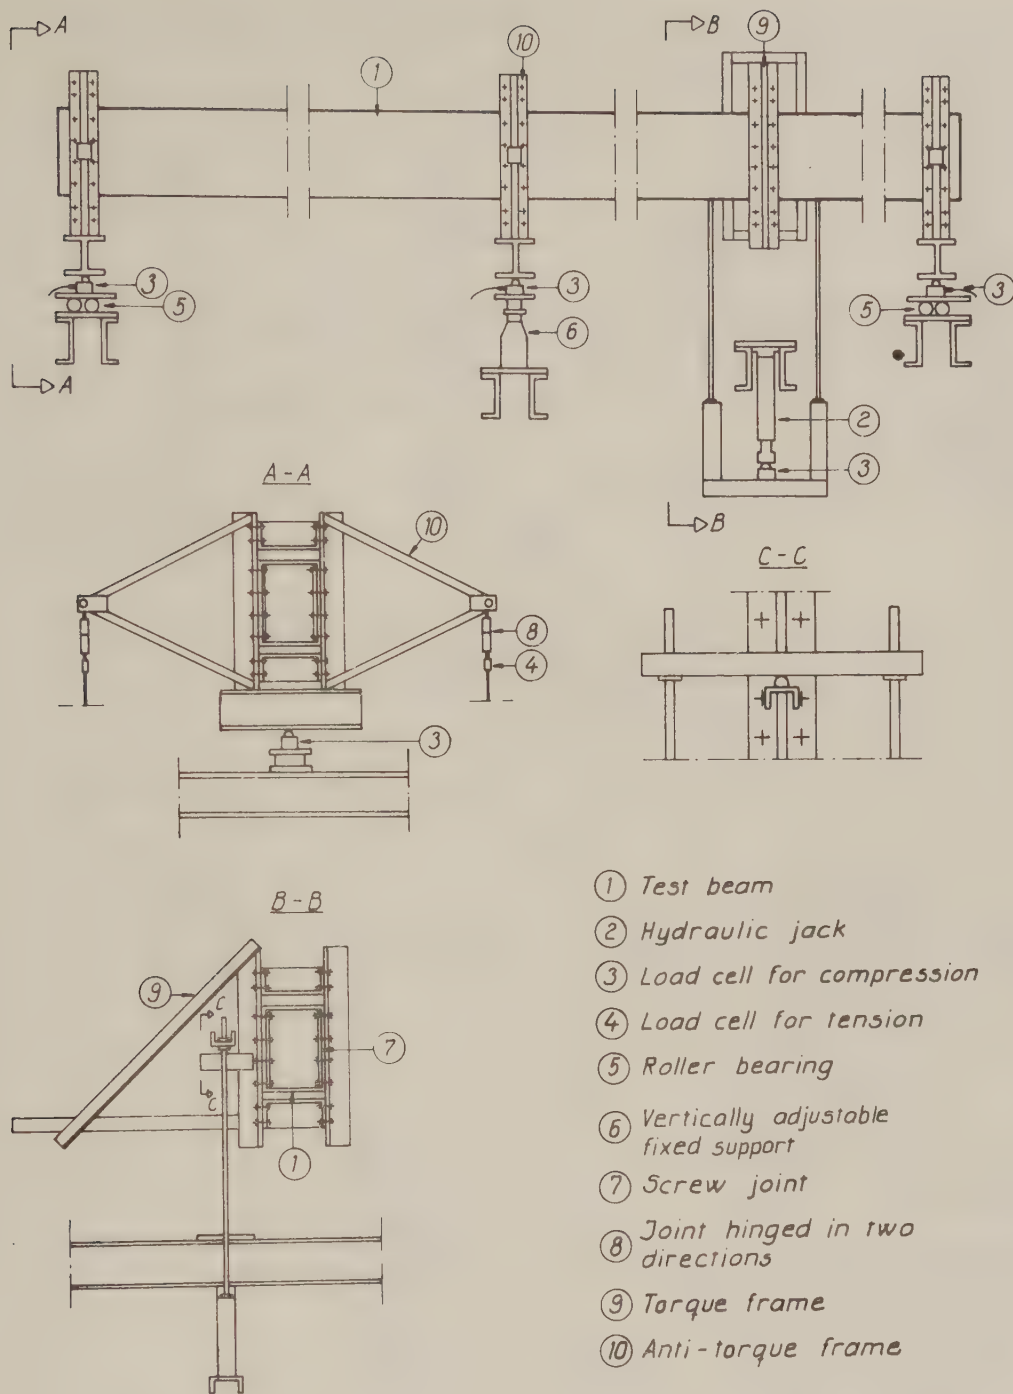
Principal loading and support arrangements for test beam H1.
